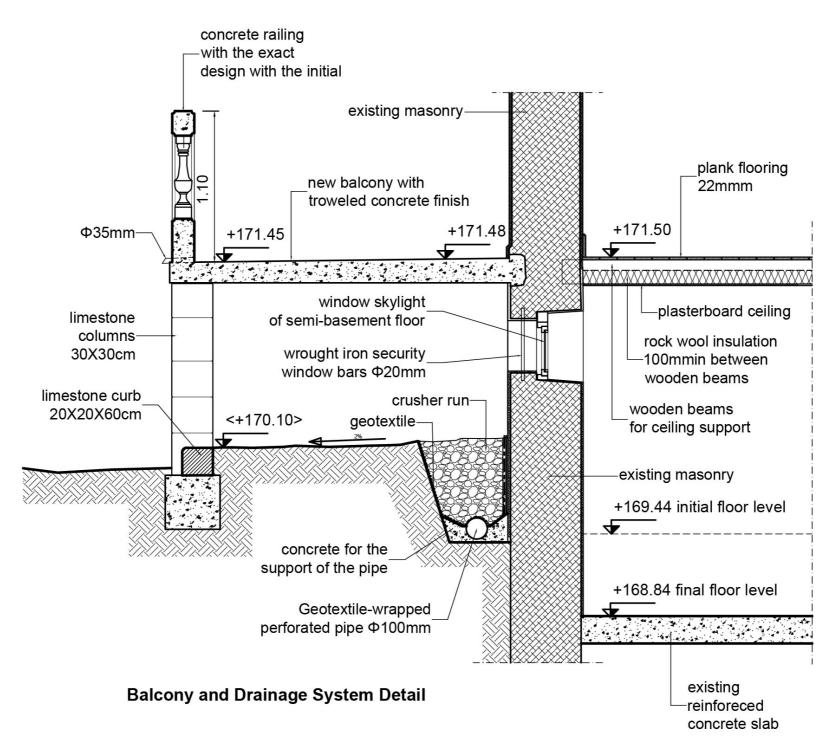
Balcony and Drainage System Detail. © C. Marathovouniotis
